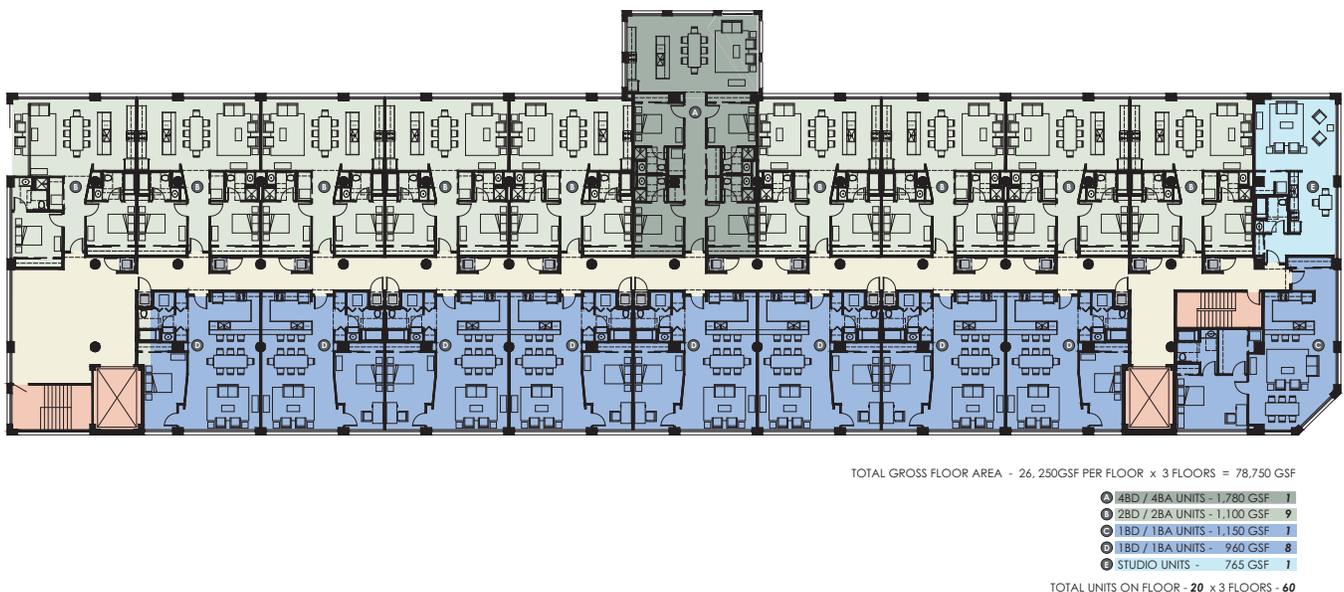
Building 24 - Potential Typical Residential Floor Plan (CJS)
